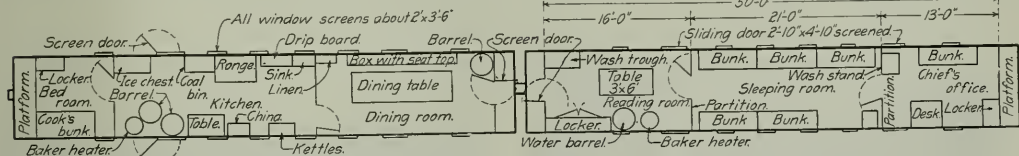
Floor Plan Showing Arrangement and Equipment of Sleeping and Dining Cars
